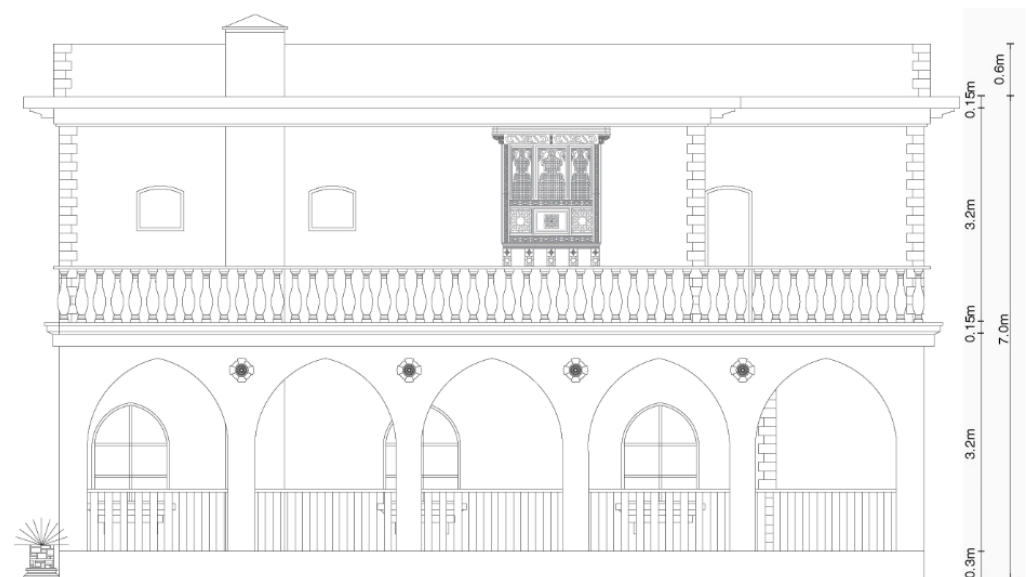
South elevation of the residence showing the existing traditional Mashrabiya (drafted by the author).
